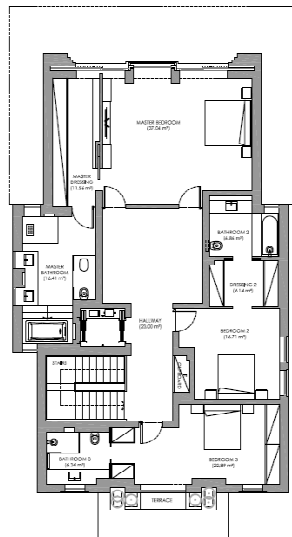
Example of the first floor of the dwelling (adapted from [23]).
